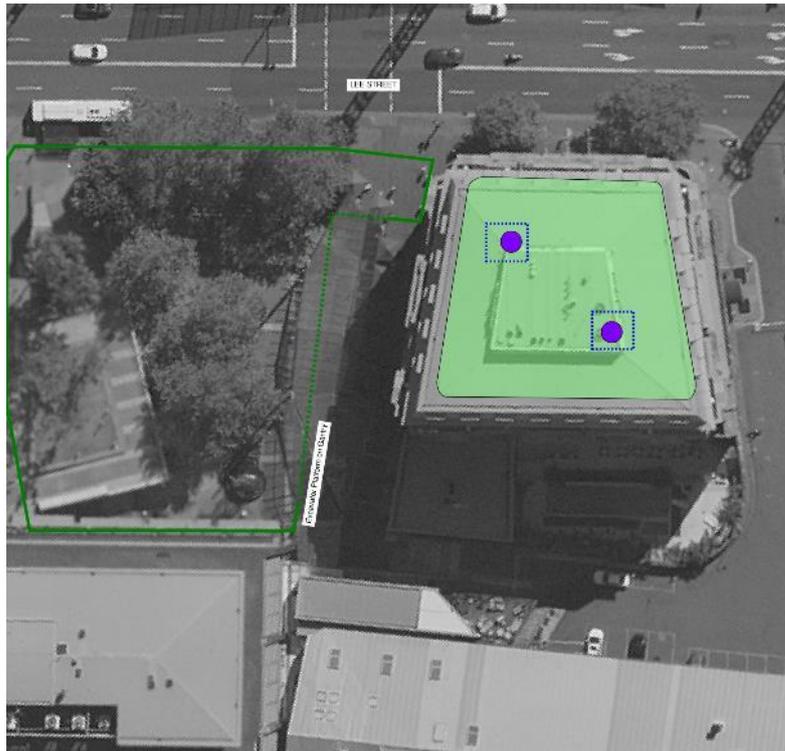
Plan view of fPPb soft internal demolition works shown in green and the socket demolition works shown in purple.
